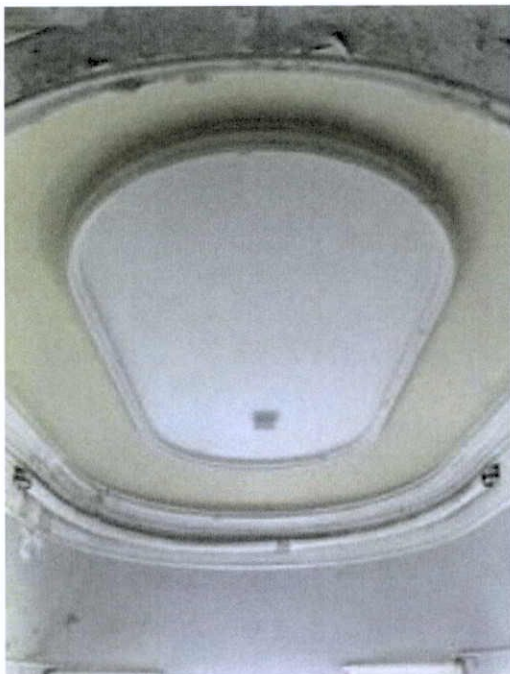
Coffered ceiling and moulded cornice within main stairwell.
